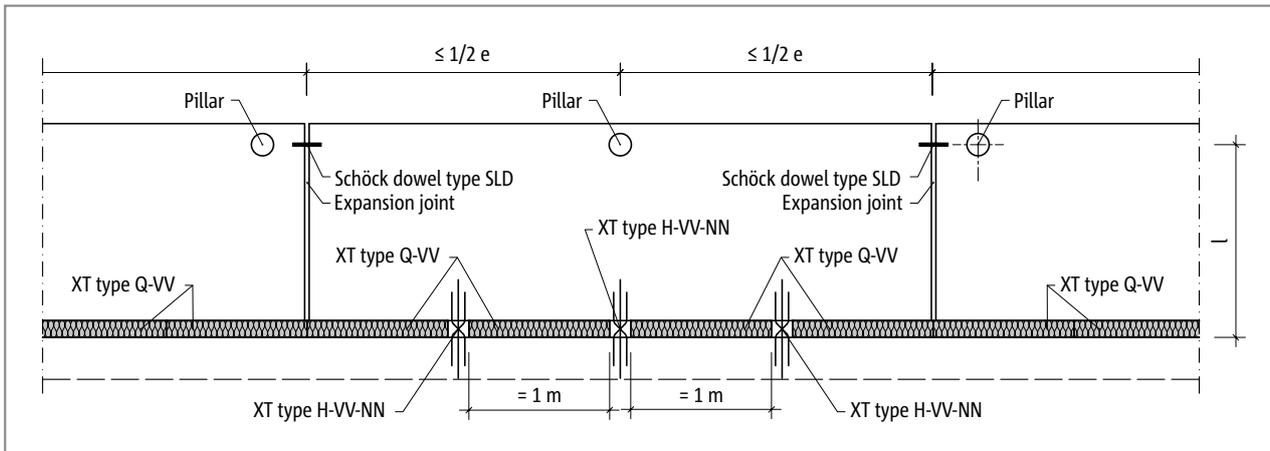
Schöck Isokorb® XT type H: Expansion joint arrangement
